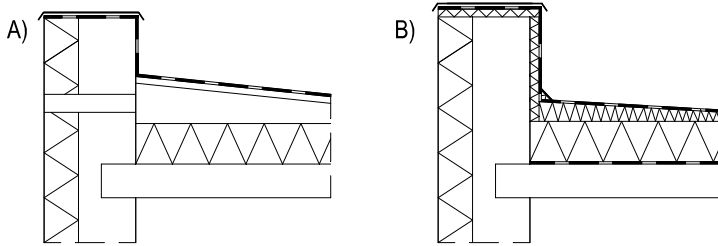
Examples of a ventilated roof and a flat roof with tapered layers (Source: own elaboration)
